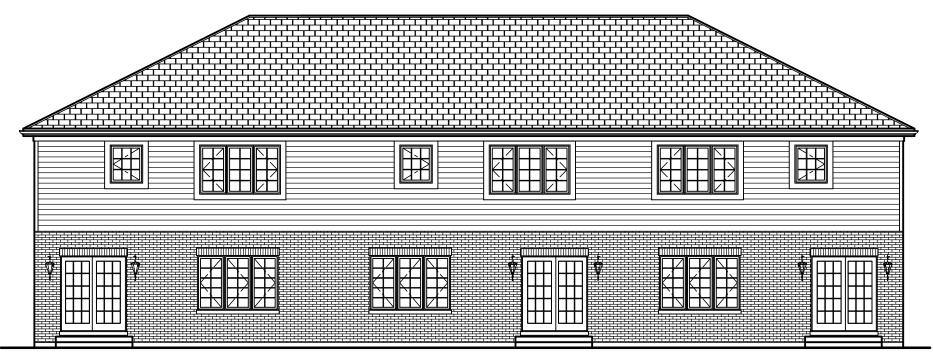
EXHIBIT K - SEVEN OAKS BUILDING ELEVATIONS
